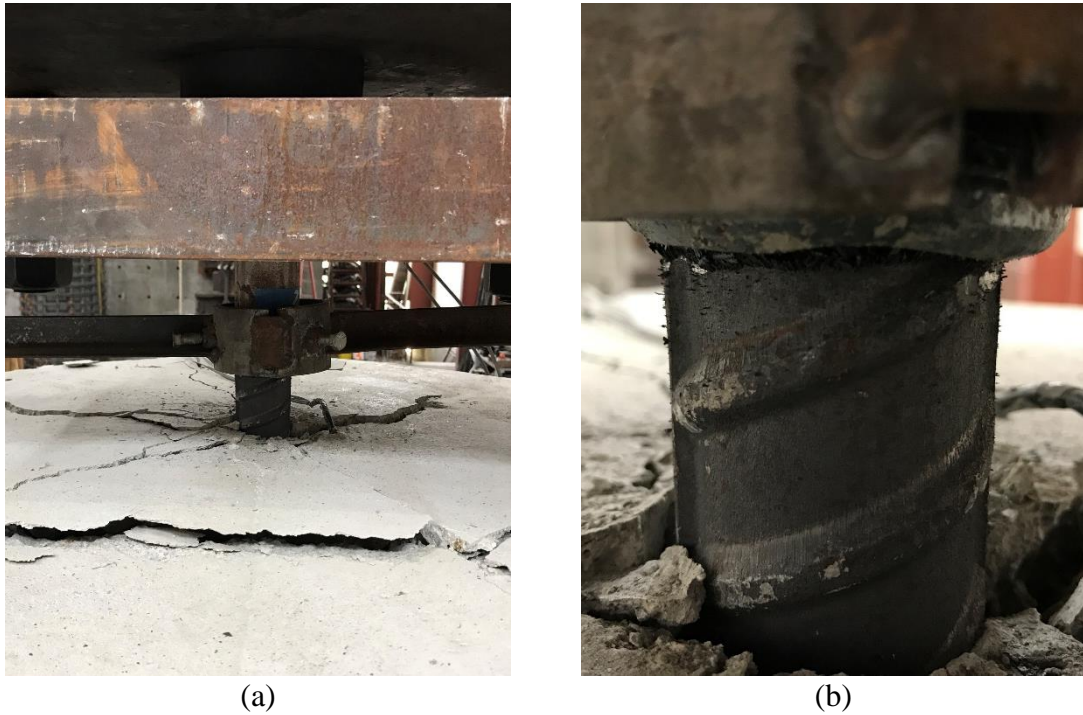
Fracture at Interface of Friction-Welded Header in Specimen #2: (a) Damage at Bar-Concrete Interface; (b) Closeup View of Header Post-Fracture
